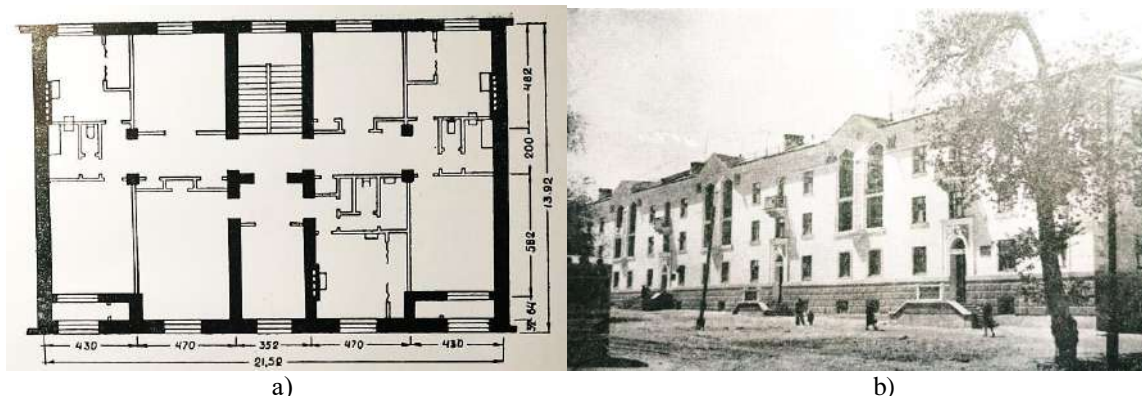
House on Uygurskaya Street (architect Bobovich), 1951-1952: a) second floor plan, section; b) the eastern facade of the building (Medykulov, 1953)
